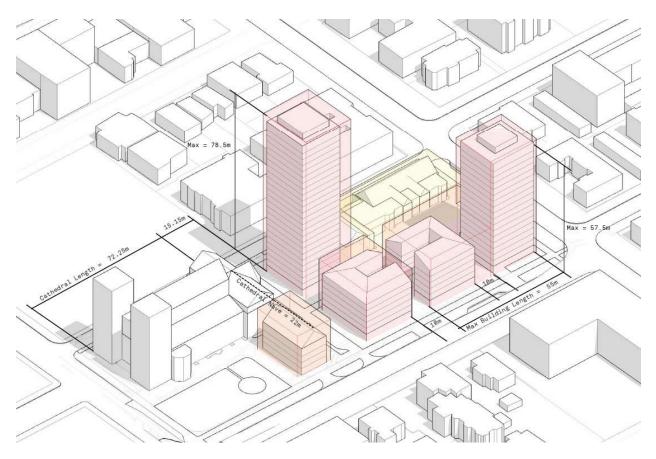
Conceptual depiction of the maximum buildable envelope on the Precinct site.
